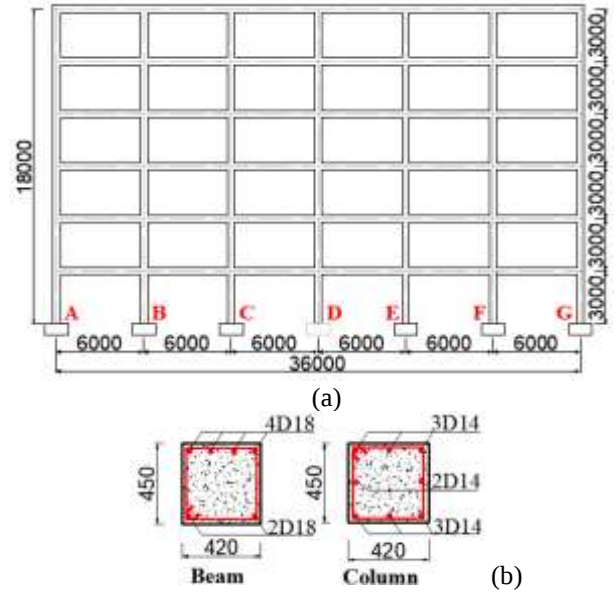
RC frame 6S6B: (a) layout; (b) cross-sections of beams and columns. (dimensions in mm)
